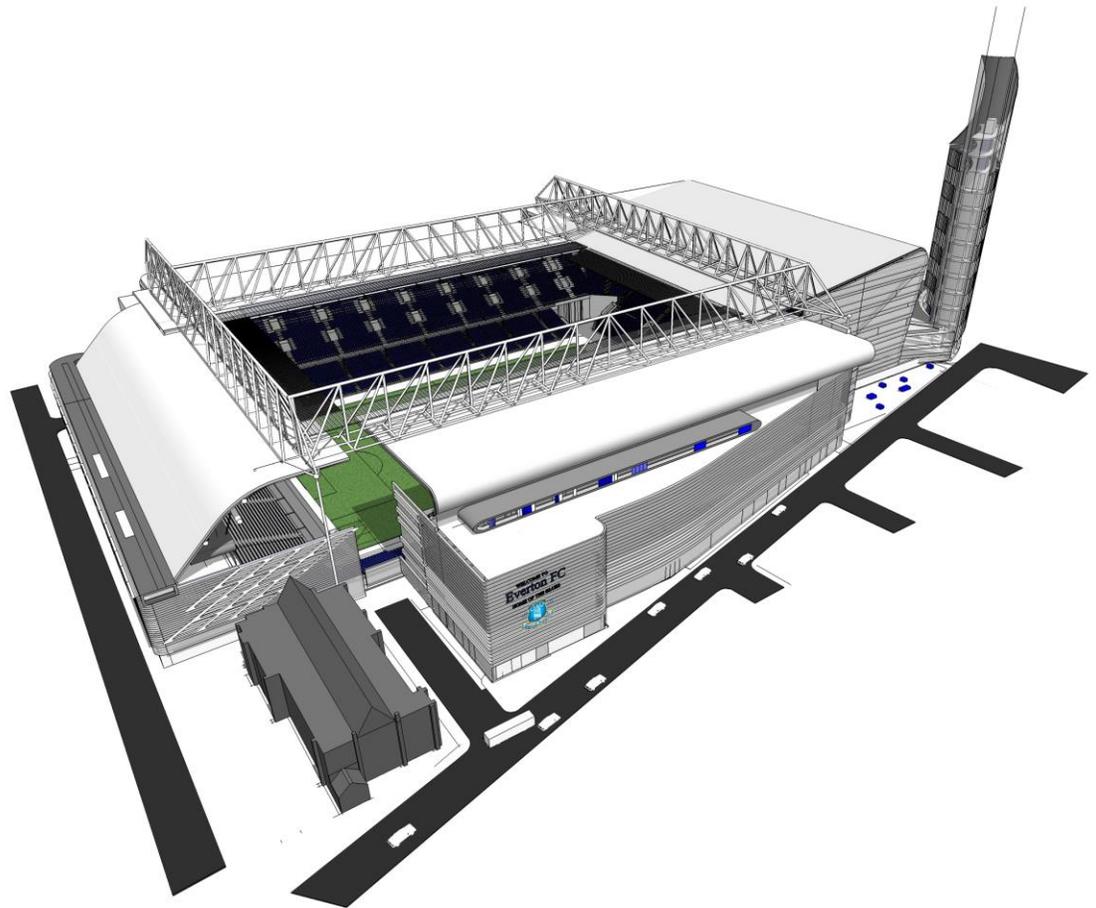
View: Mainstand side with new external cladding, and corner exec box and access tower.
